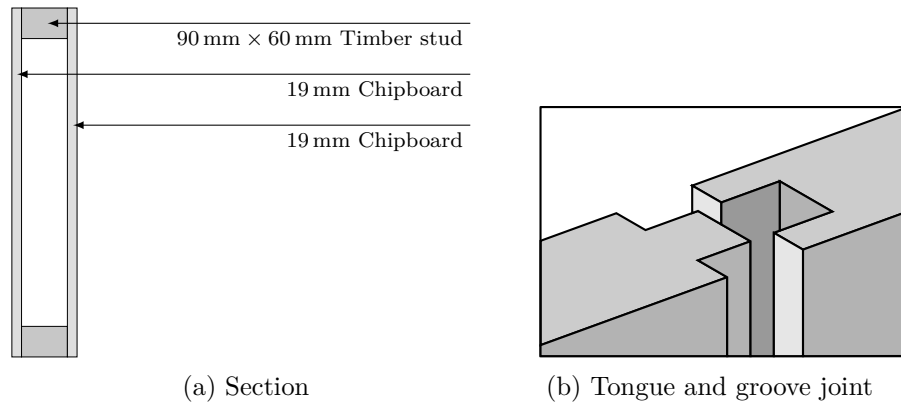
Construction of the basic timber-frame wall in the laboratory lightweight test structure.
